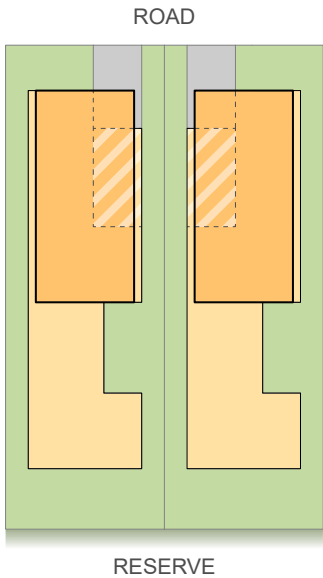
Separation from the private open space of another dwelling on the same site as required by clause 13.8.6.
